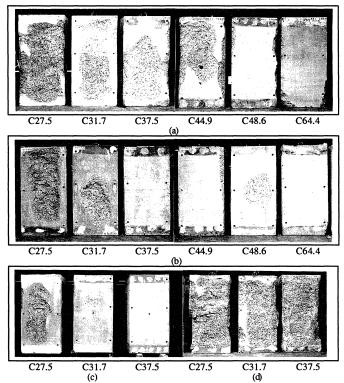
Columns after fire tests (Test Series 1, see Table 3) indicating spalling degree ((a) RC column, concrete age 2 months, ISO834 fire, (b) RC column, concrete age 1 year, ISO834 fire, (c) concrete column without reinforcement, concrete age 2 months, ISO834 fire, (d) RC column, concrete age 2 months, DIN4102-11 fire)
